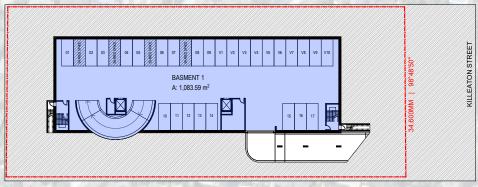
Concept Basement Plan Source: Mackenzie Architects International
